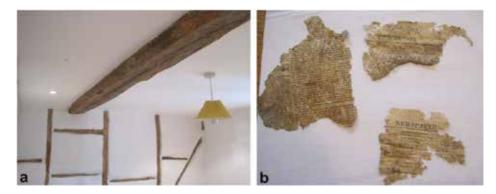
15 Halton Village: a) Timber beams. b) Newspaper cuttings, 1878
